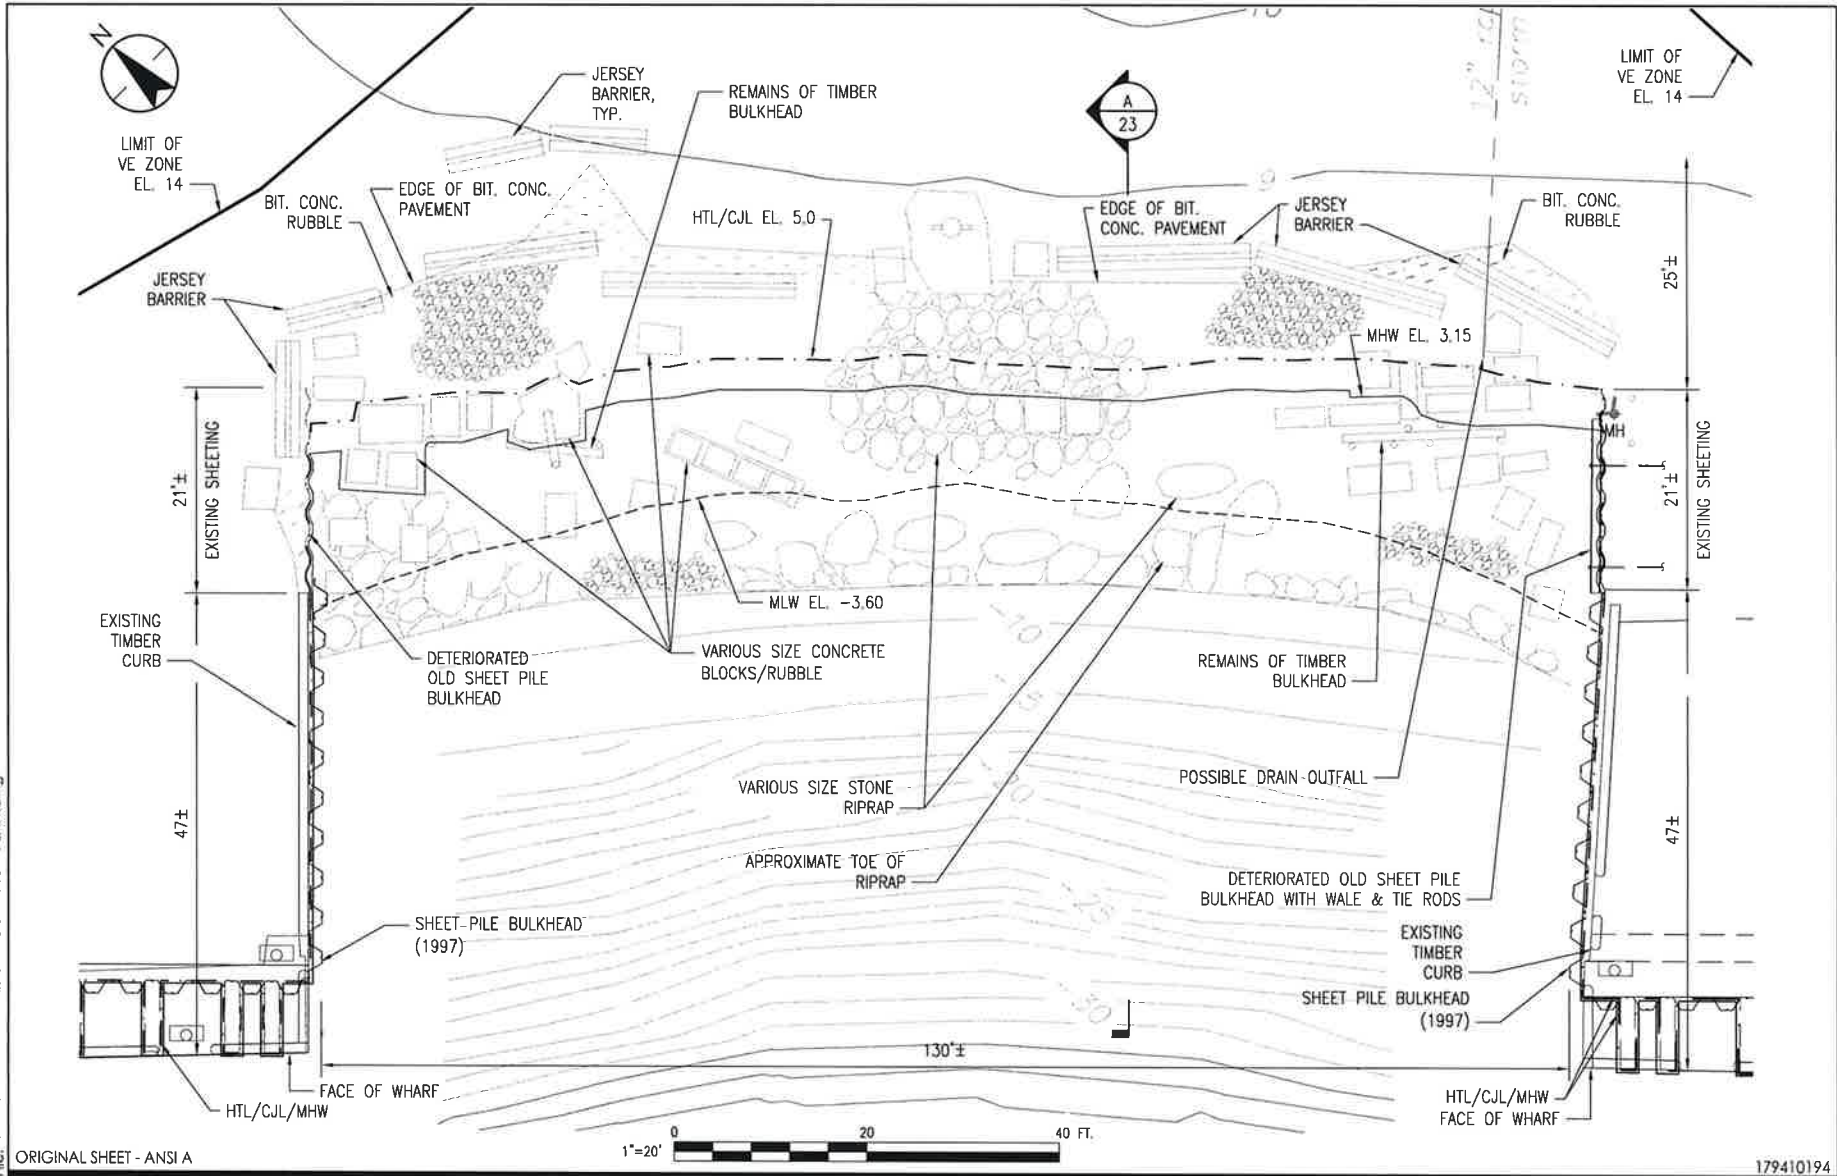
RIP-RAP AREA EXISTING CONDITION PLAN.dwg
